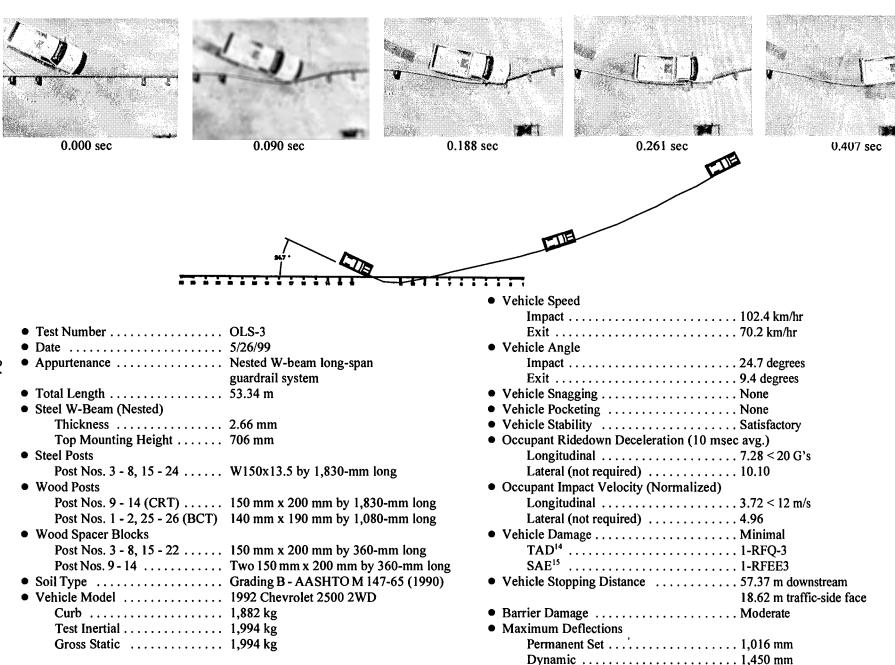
Summary of Test Results and Sequential Photographs, Test OLS-3 (Design No. 3)
